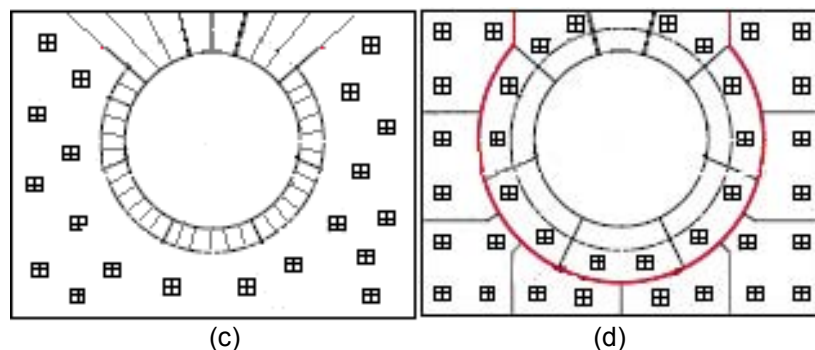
Chamber in especial shapes and wall in ramming (Plastic material) (c) x Chamber in precast shapes and wall in castable/casting (d)
